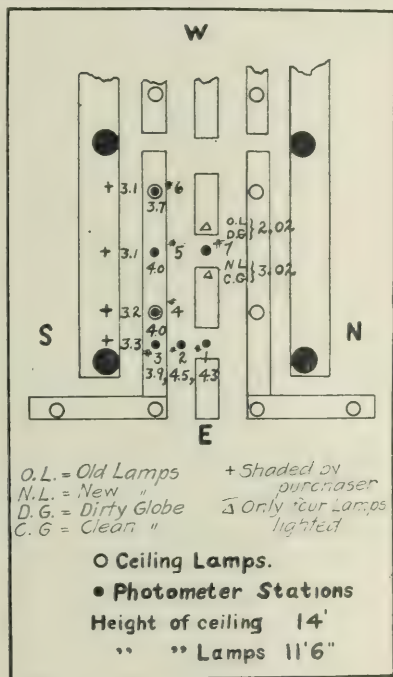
Section plan of second floor, (infants' wear), showing location of furniture, pillars, lighting units, test stations and illumination data.
